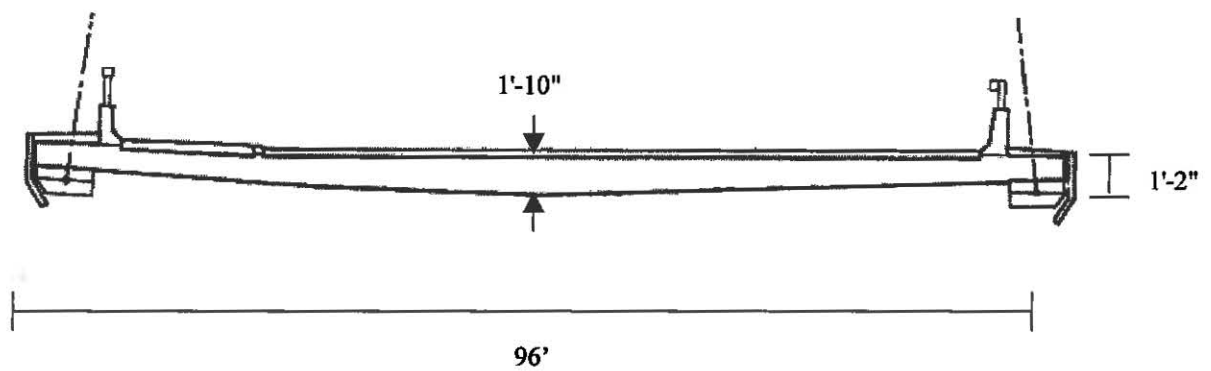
Cross Section of Precast Concrete Slab Deck Configuration
